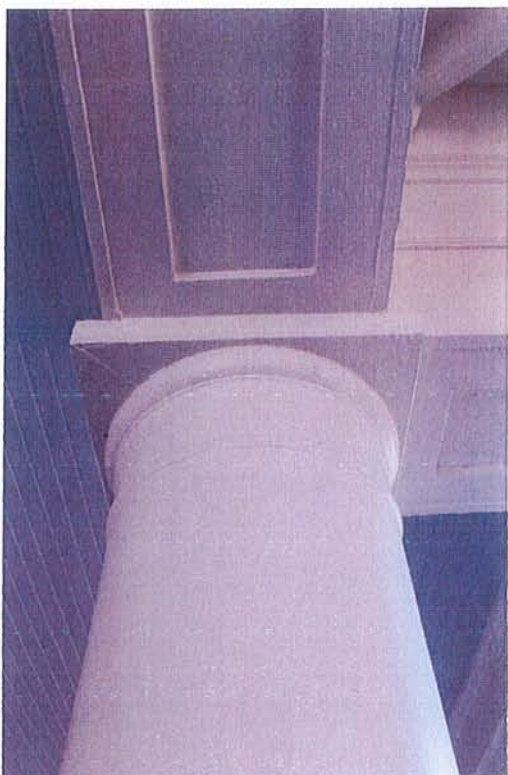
Porch detail, capital of Tuscan column and paneled soffit (NE corner)
